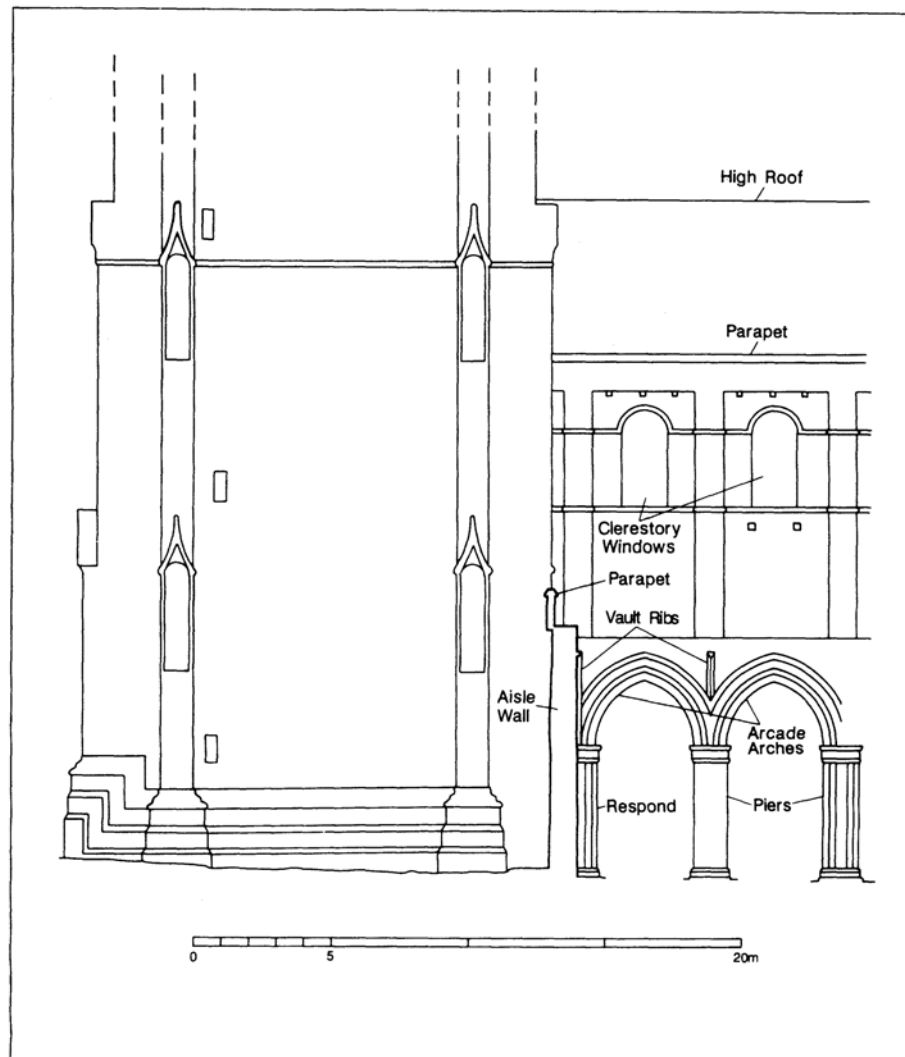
Furness Abbey—reconstruction drawing of the south faces of the west tower and southern nave arcade wall (bays 8 and 9).
